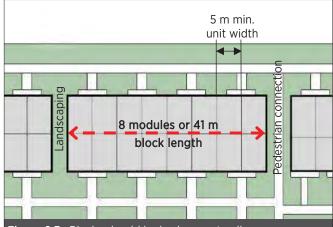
Blocks should be broken-up to allow green space and pedestrian connections
